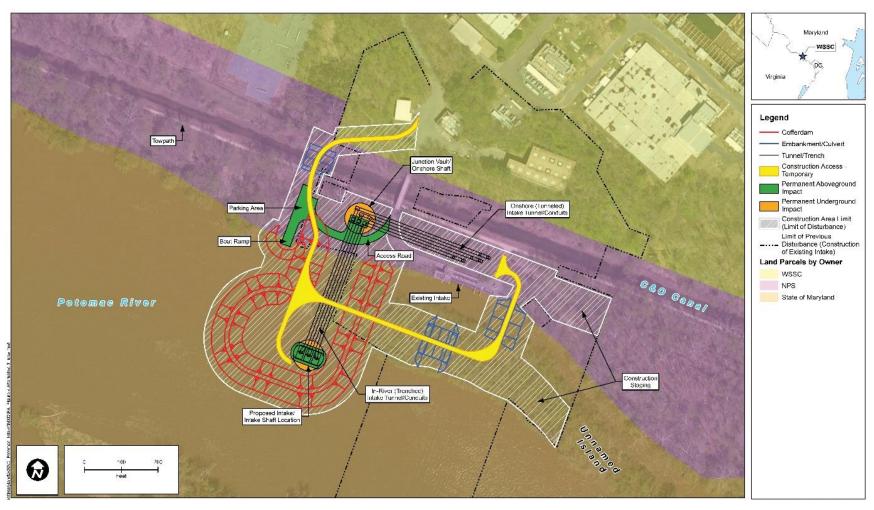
Alternative 3, Trenching/Tunneling to Onshore Shaft West of Existing Intake.
